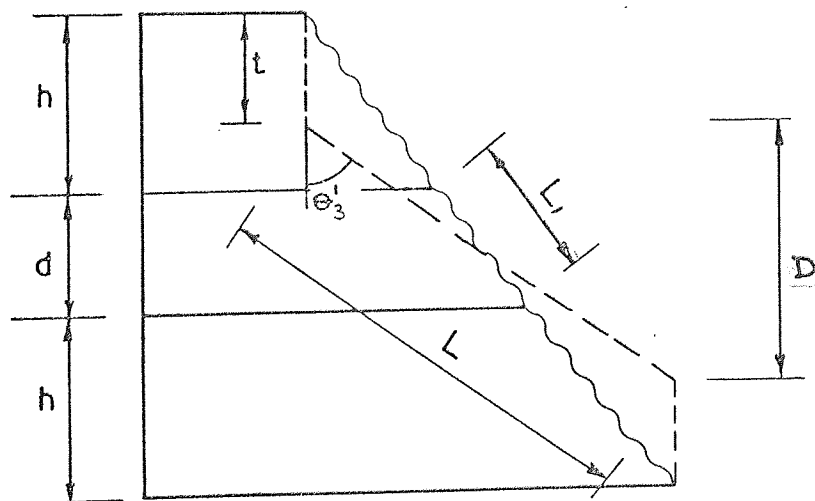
Developed distorted failure plane for plain concrete - trapezoidal cross section.
